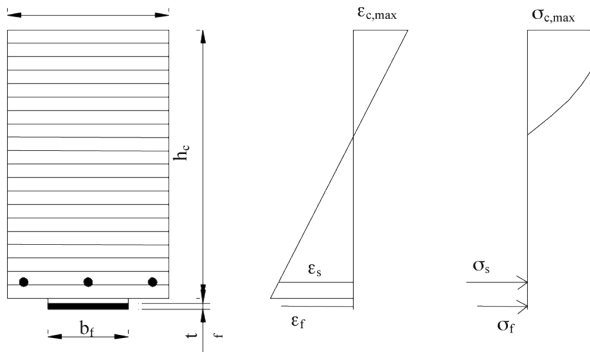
Cross section of the FRP-strengthened beam: relevant dimensions and fiber discretization of the reinforced concrete portion.
